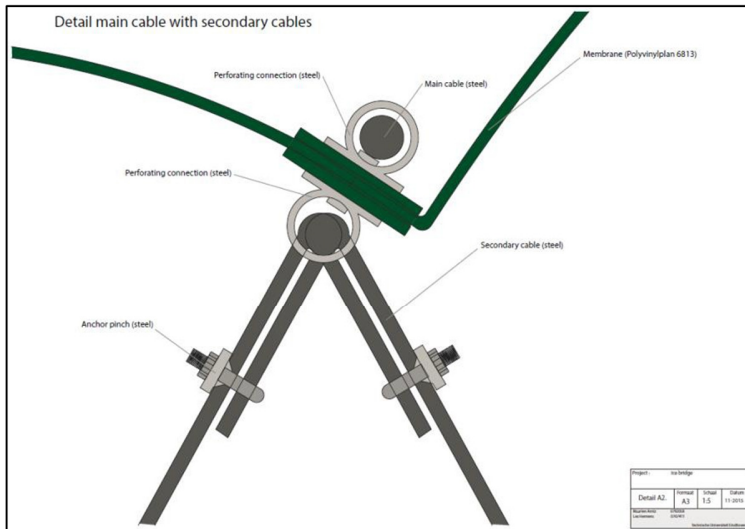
Detail for connecting membrane, main cables, and stabilizing cables
